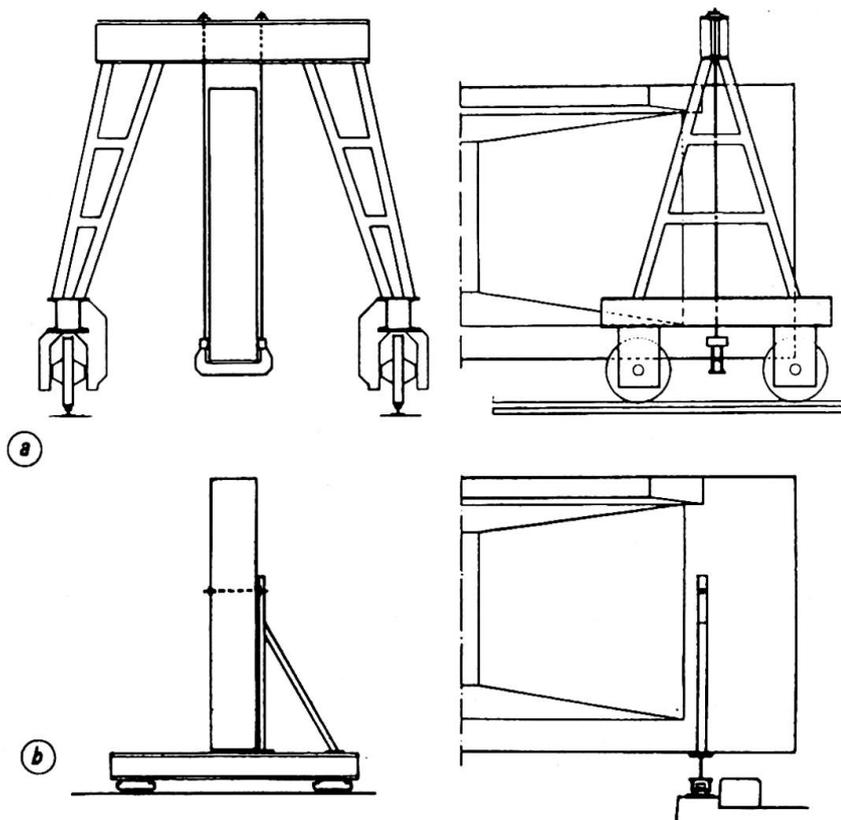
Longitudinal and transverse transport of bridge beams.
